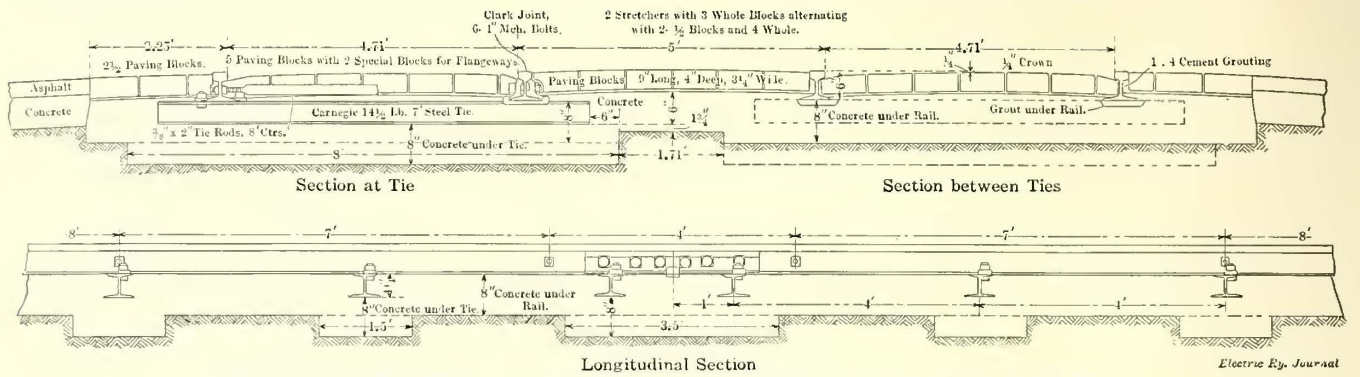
Utica & Mohawk Valley—Standard T-Rail Construction with Steel Ties
